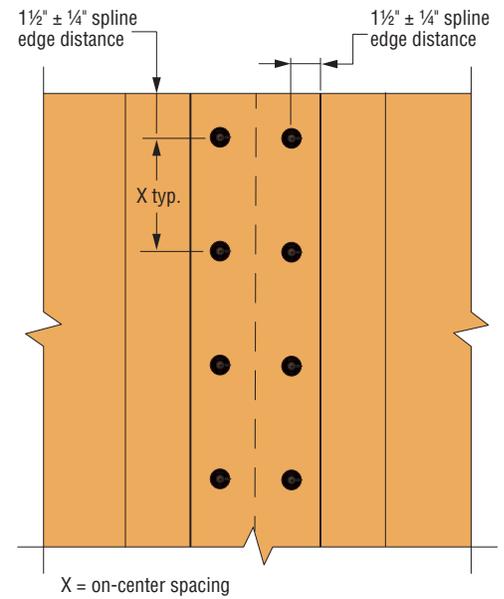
Fastener layout plan — Fastener end distance in the spline shall be 1.5 ± 0.25", and fastener edge distance in the spline shall be 1.5 ± 0.25". The nominal fastener spacing is "X".
